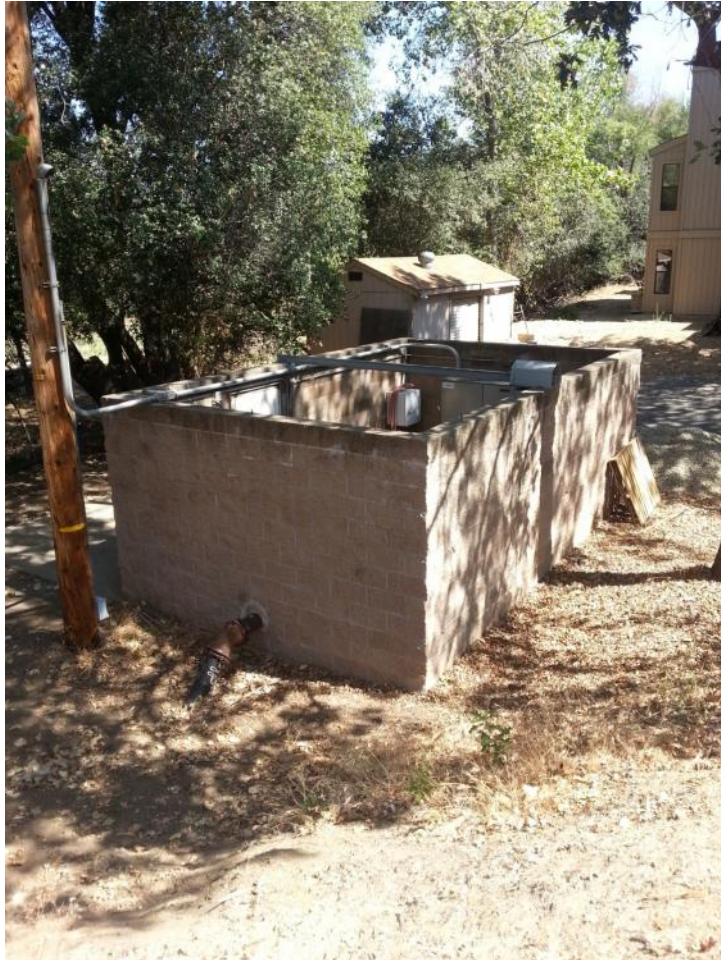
View of Shadowbrook lift station, enclosure, and Shadowbrook Apartment complex, view northwest.
